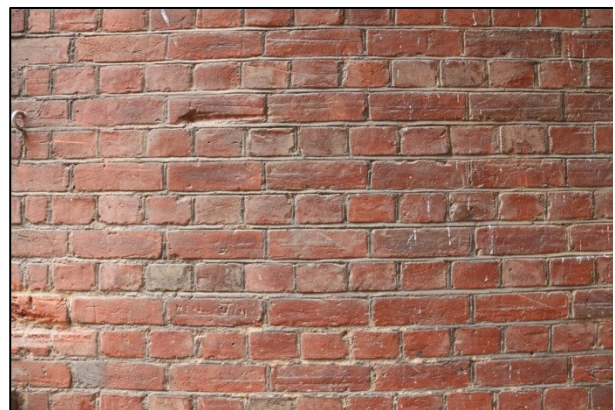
Detail of brickwork of wall of Building 1 (under the carriageway arch), facing east
